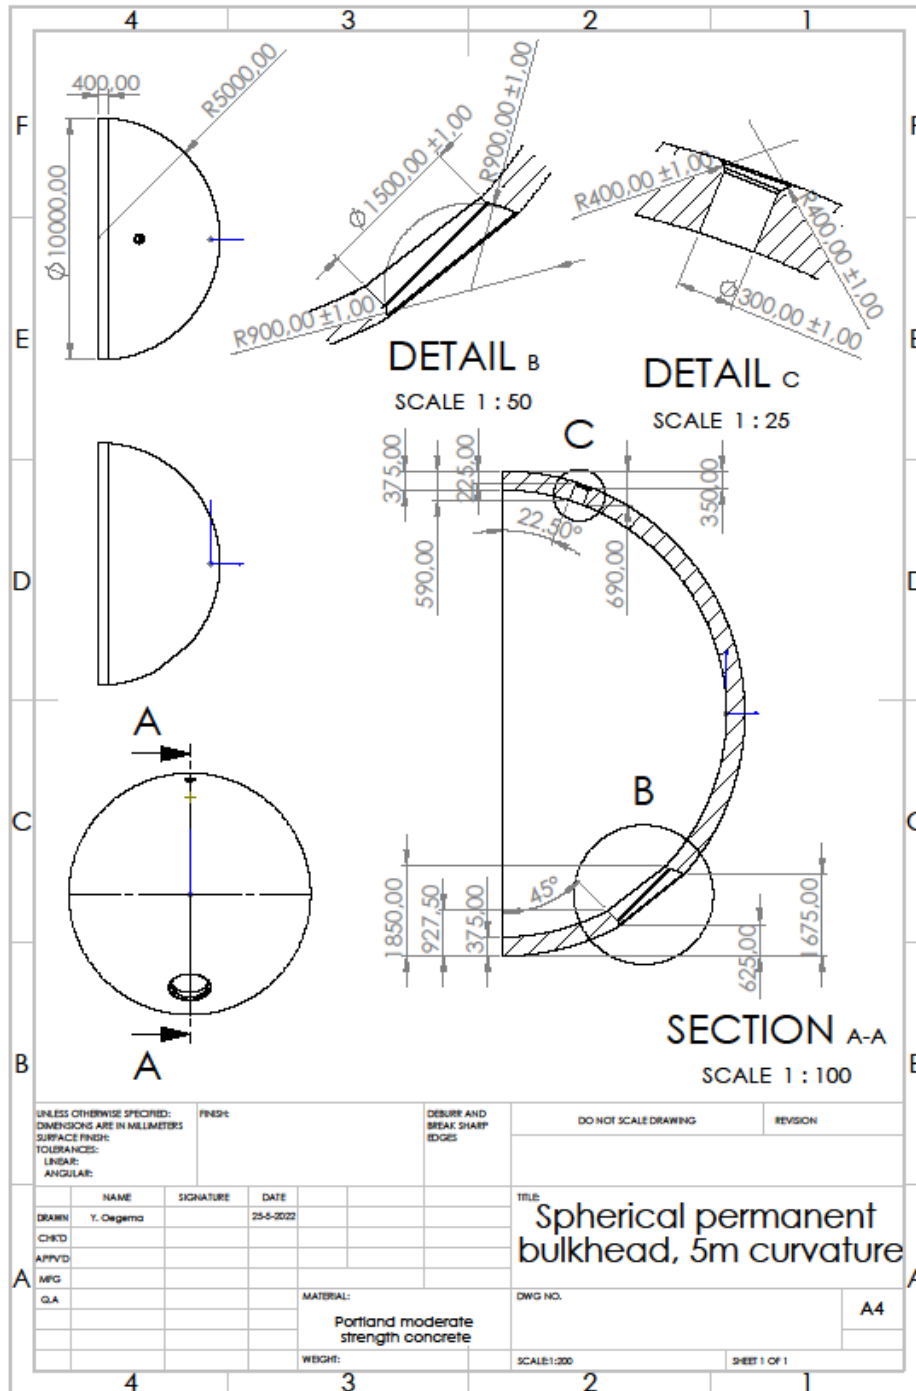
2D technical drawing for the 5m curvature spherical permanent bulkhead, dimensions are in millimeters
